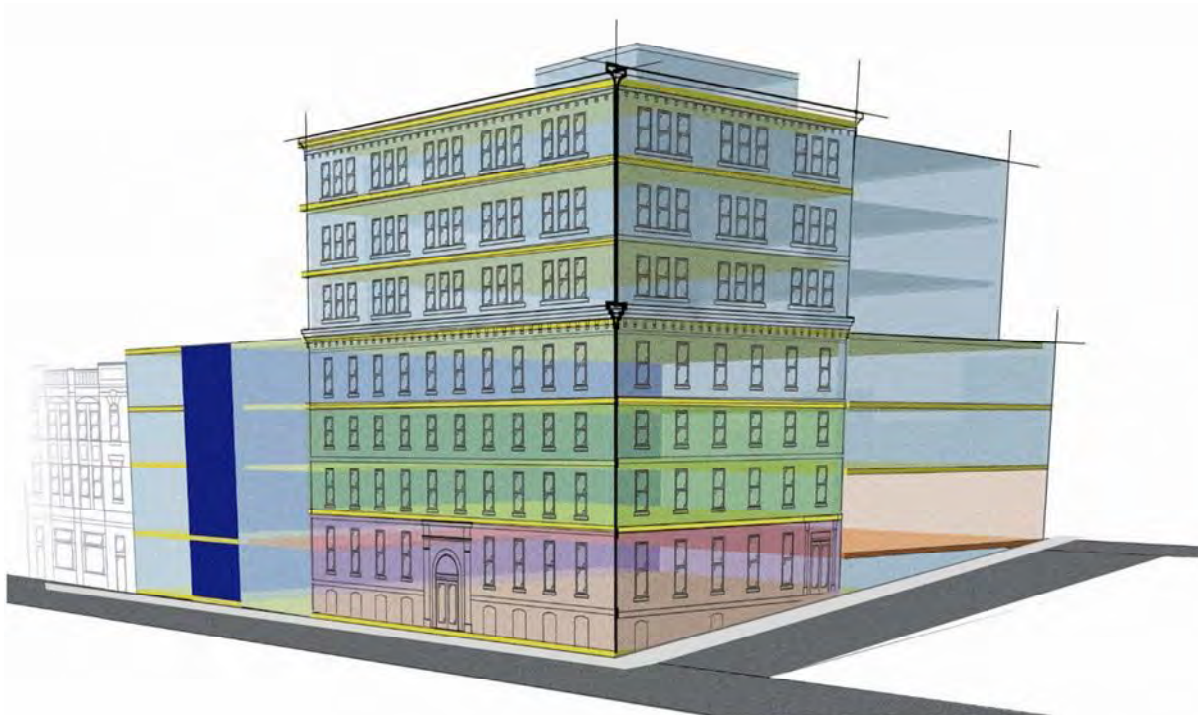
Façade of Dennis Building incorporated into new structure (for further details see Design Guidelines, Figure 5.9)
